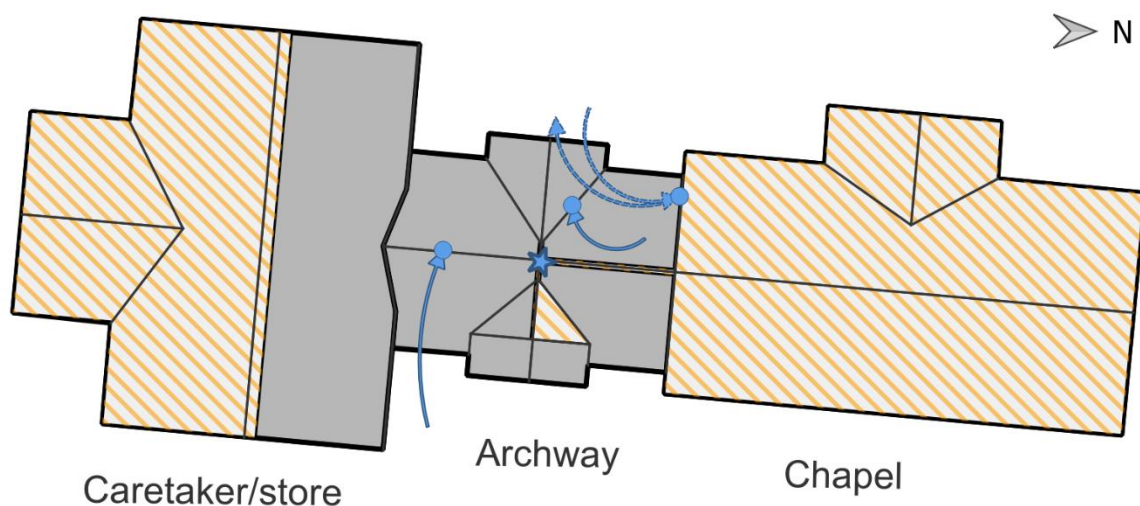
Roof Plan of the Building – Original, Re-entry, and Emergence Locations
